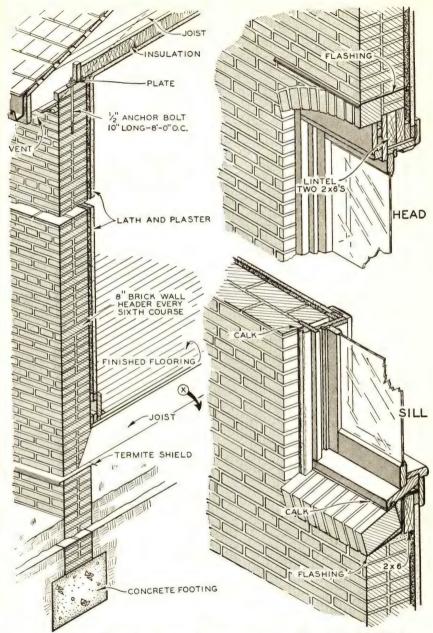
Section View and Window Details for a Typical Eight-Inch Brick Wall
